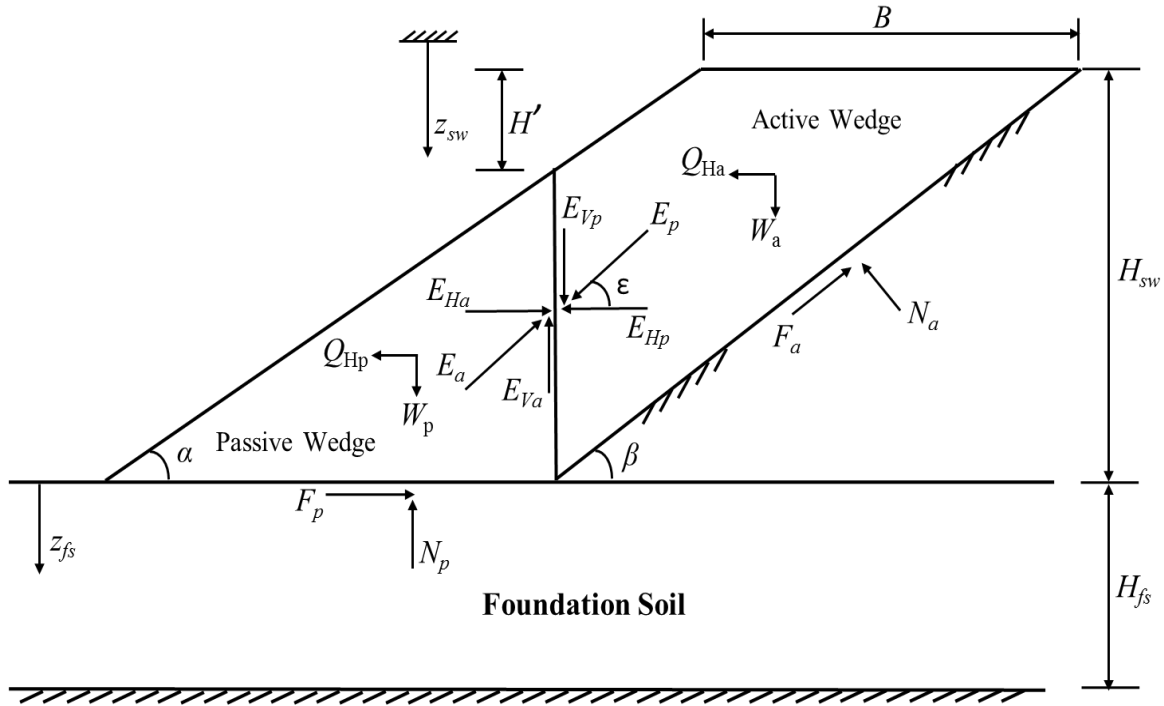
Used model MSW landfill resting on a foundation soil
